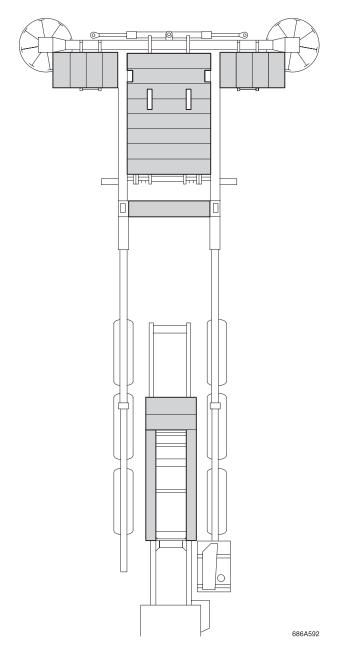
Slide Frame Decking Positions for Bridge Build
